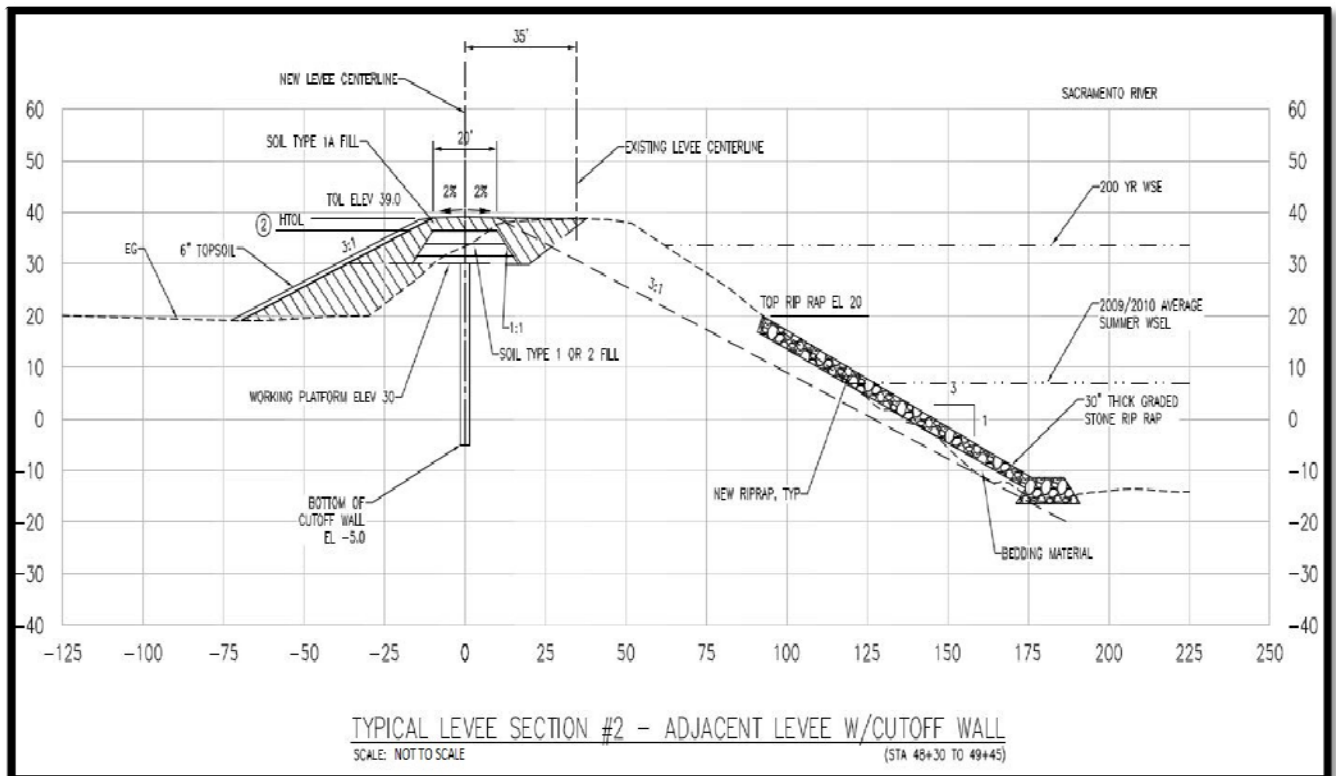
Typical Cross Section – Adjacent Levee with Cutoff Wall
